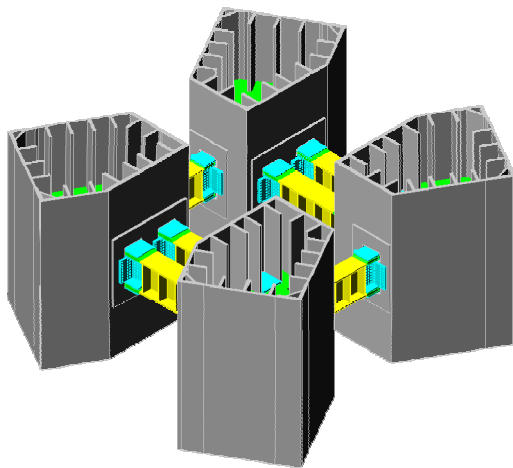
Cross section through tower of proposed east bay crossing of the San Francisco - Oakland Bay Bridge.
